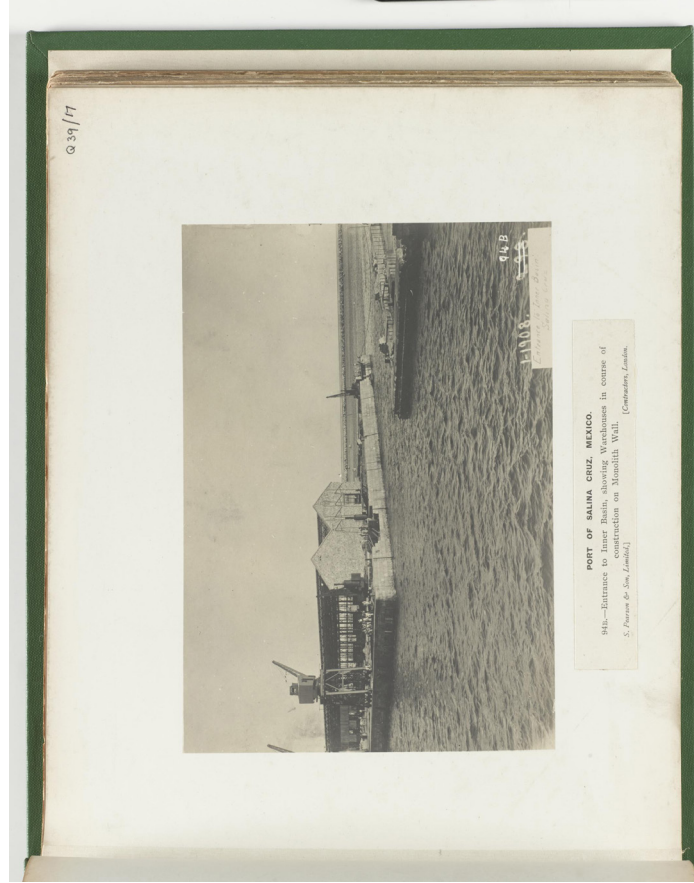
Unknown author, “Entrance to inner basin, showing warehouses in course of construction on monolith wall”, 1908
